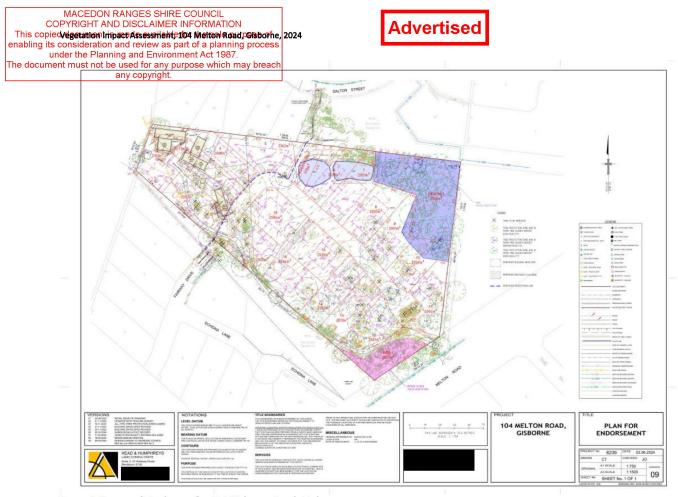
Proposed site layout for 104 Gisborne Road, Melton.
